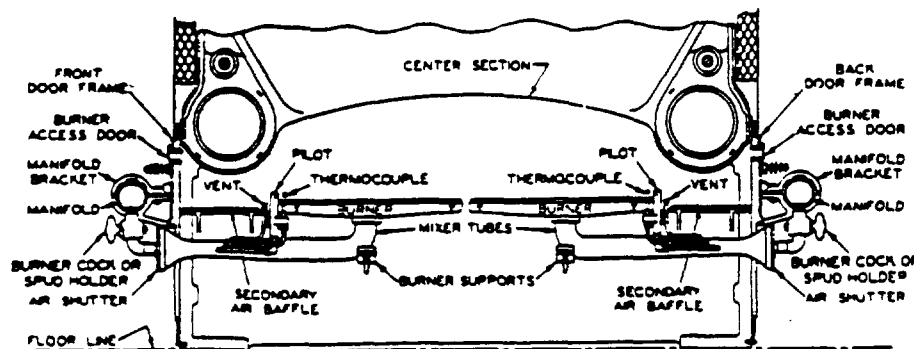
Burner Installation—Pilot Burner, Thermocouple and Vent Tube
